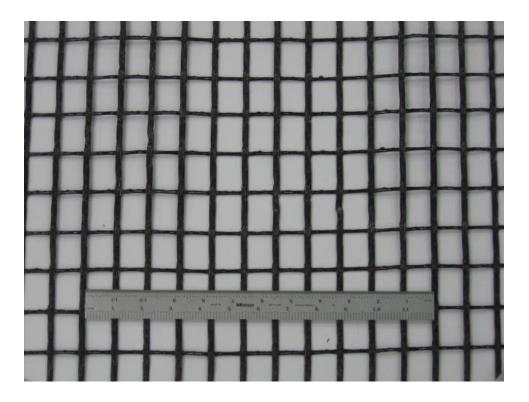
Photo of Miragrid 7XT (machine direction is perpendicular to ruler shown).
